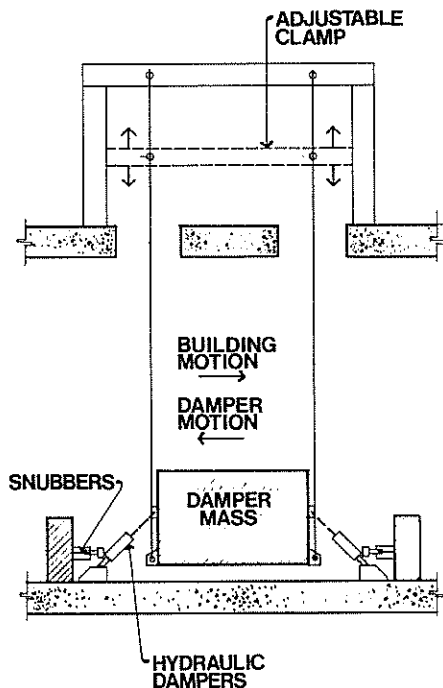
Pendulum-type damper (Courtesy TACET Engineering Ltd., Toronto)
